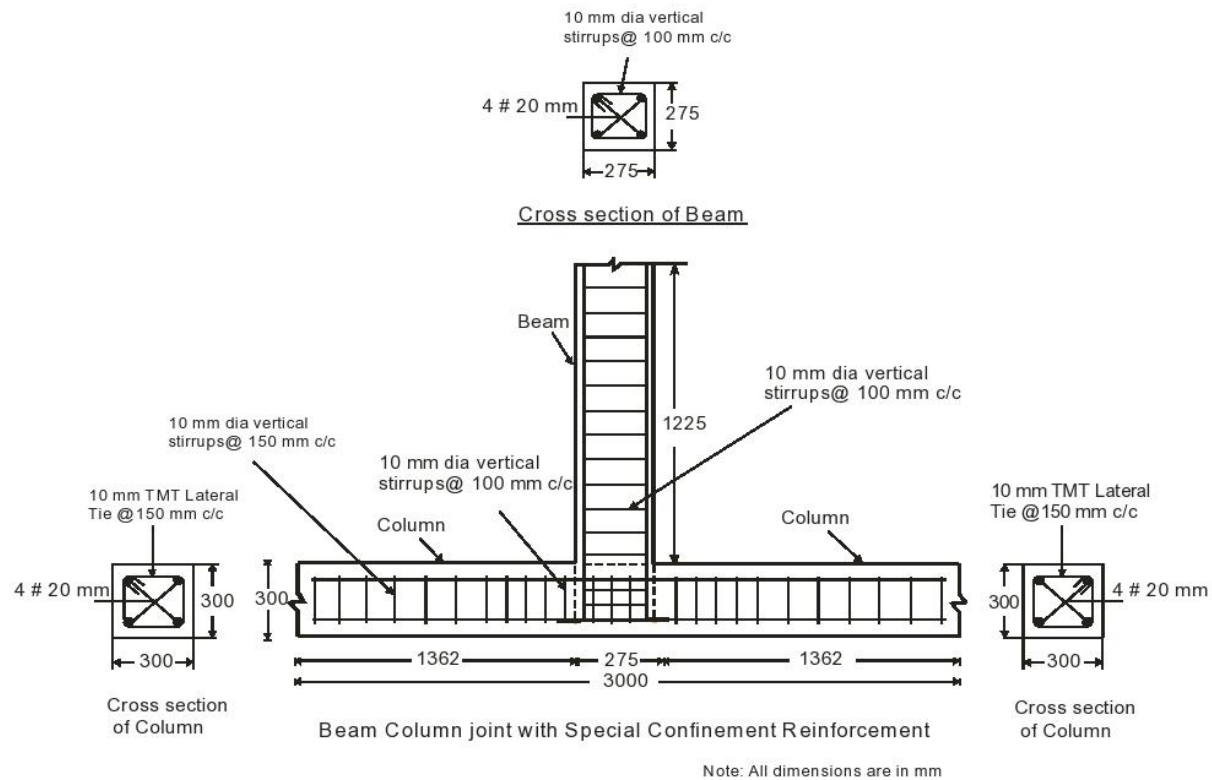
Reinforcement detailing and cross section details of confined specimen
